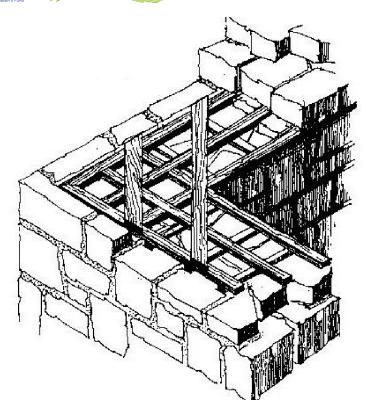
Timber ties used to connect the different masonry layers (Merxhani, 2012)
